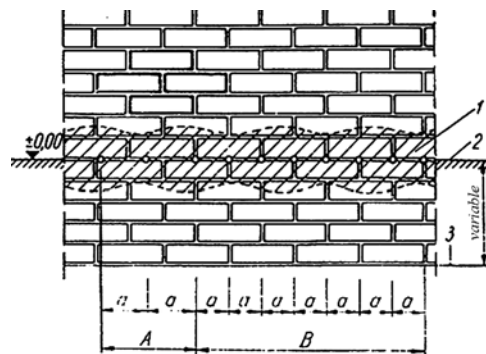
Treatment with synthetic resins: A, B - incorrect and correct positions of pipe fittings; a - distance between pipe fittings; 1 - impregnated zone, 2 - ground elevation, 3 - foundation elevation
